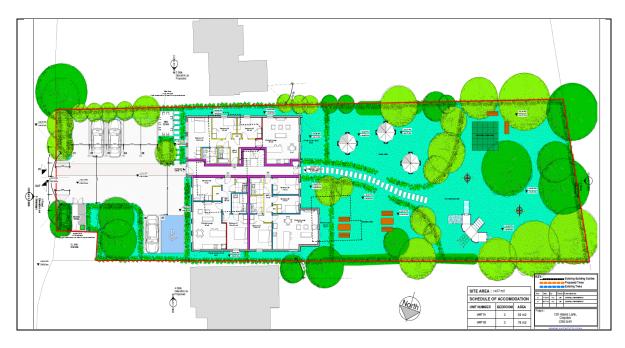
Ground floor plan proposed site showing proposal in relation to neighbouring properties
